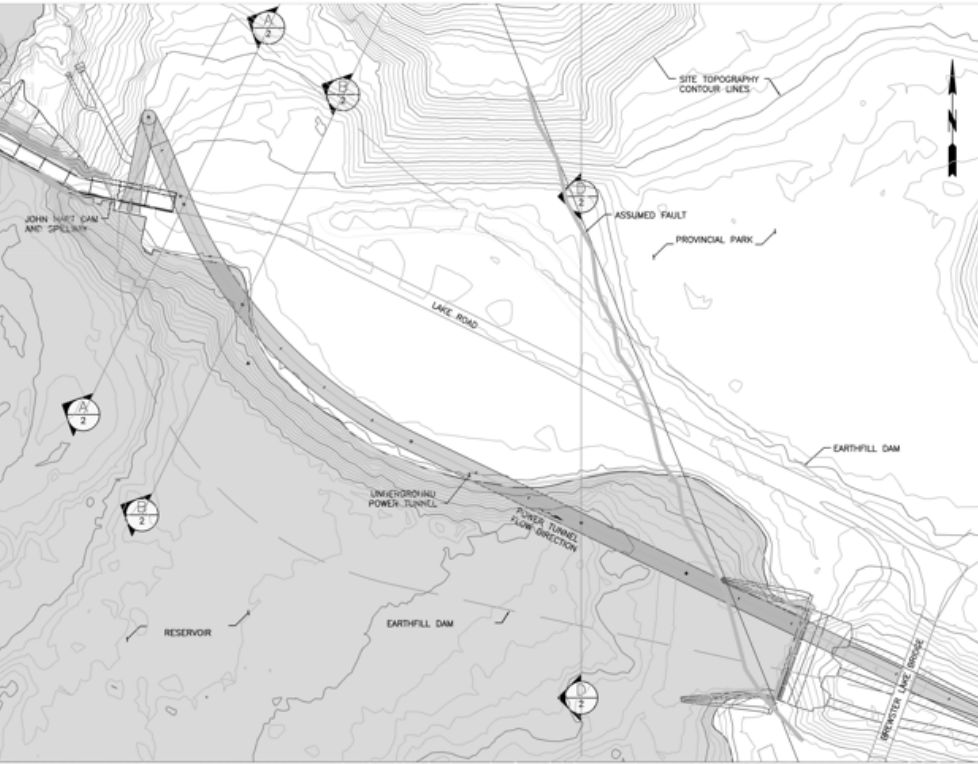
Plan of the Tunnel Under the Earthfill Dam
